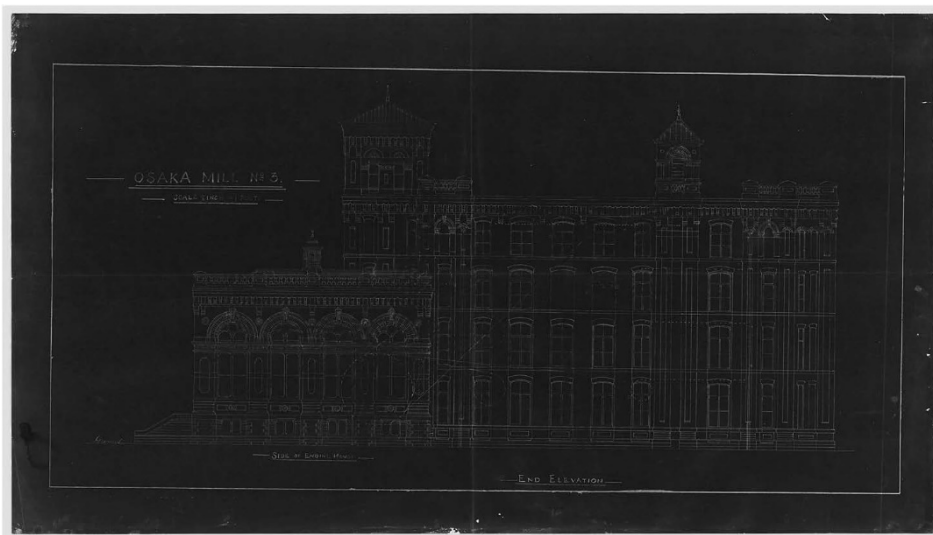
Southeast side elevation, Mill No.3 at Osaka Bōseki [2-18]
